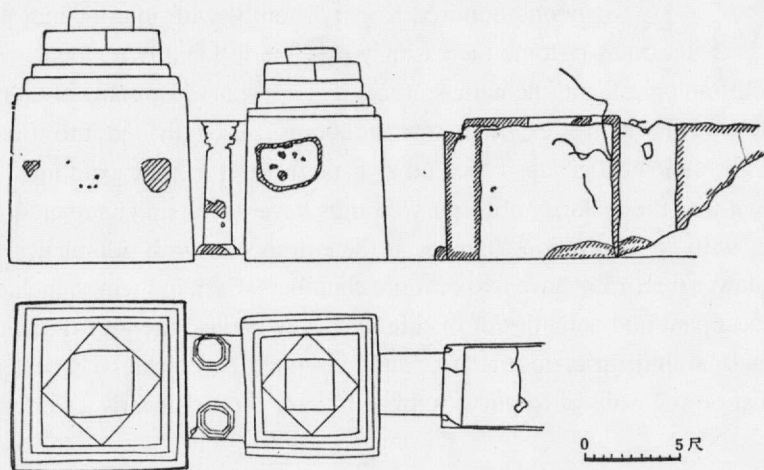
Plan and side sectional drawing of Twin Pillars Tomb. After Kasai, pls. 529-530.
